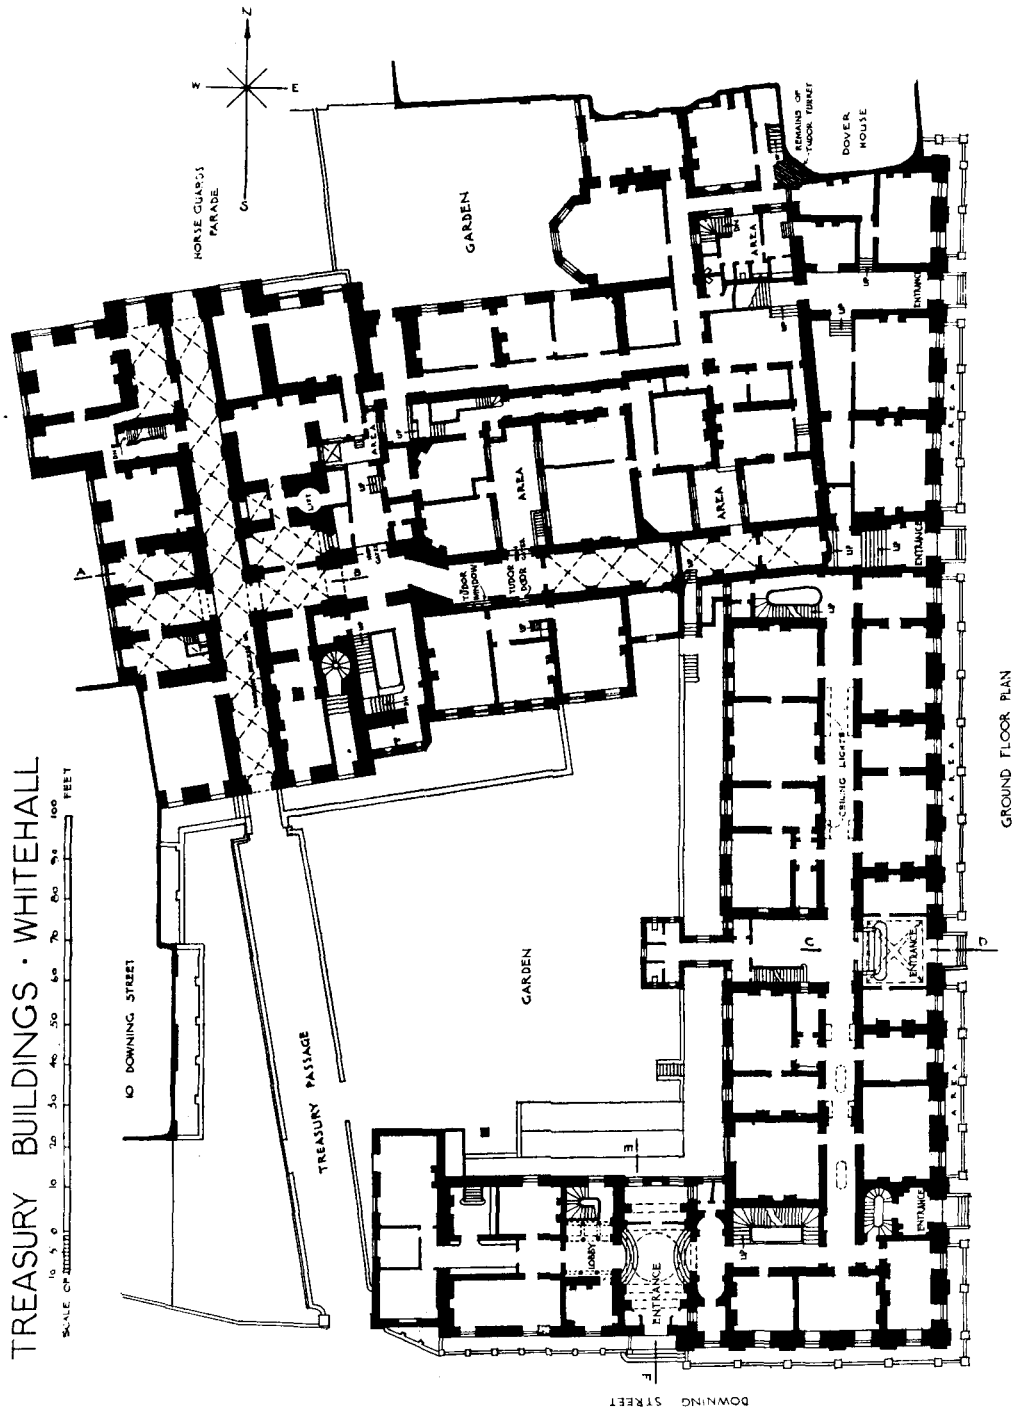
Whitehall: Treasury buildings c. 1850, ground-floor plan (LCC, 1931, XIV, Pl. 82) (Greater London Photograph Library)
